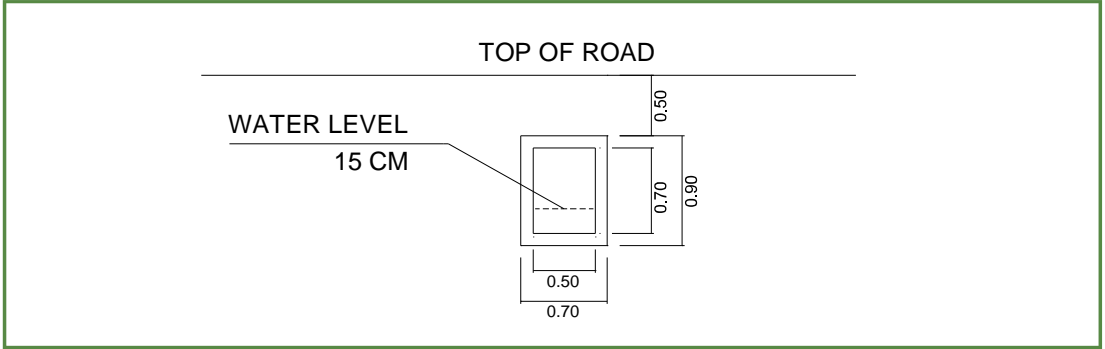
DETAIL OF BOX CULVERT - 1 (MENTENG AREA 2)
